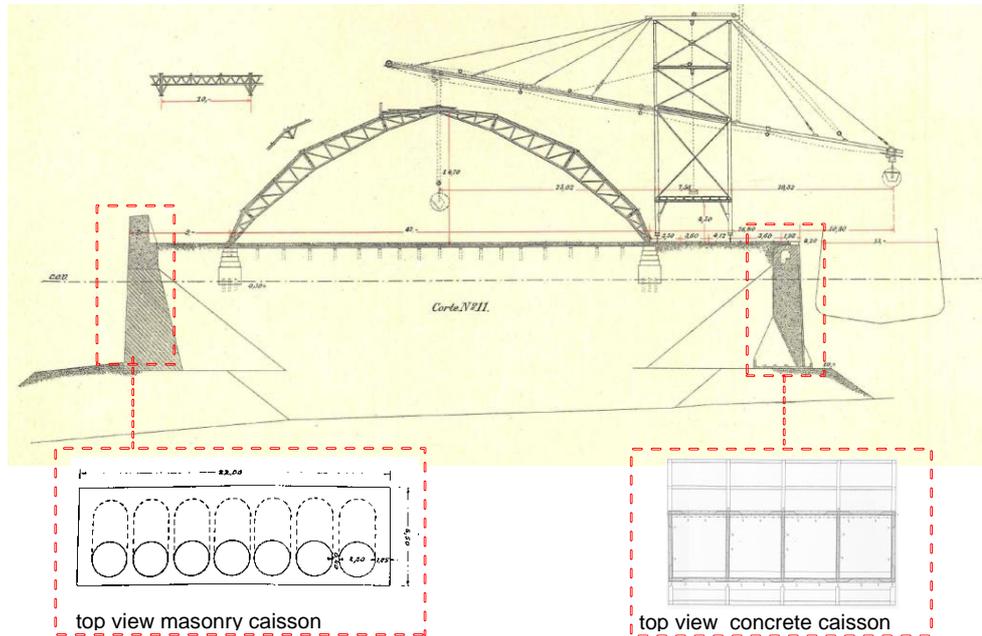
Sheltered quay wall (right) and unsheltered quay wall (left) designed by prof. Kraus for the Dock el Baron in Valparaiso, Chile (1903)
